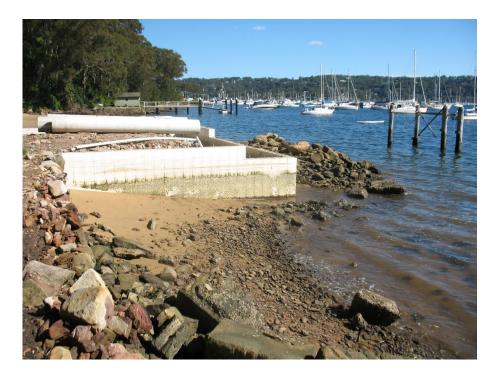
Foreshore: artificial sandstone retaining wall, foundation walls and pile of boulders (northern side). Four piles of the former jetty were present offshore.
